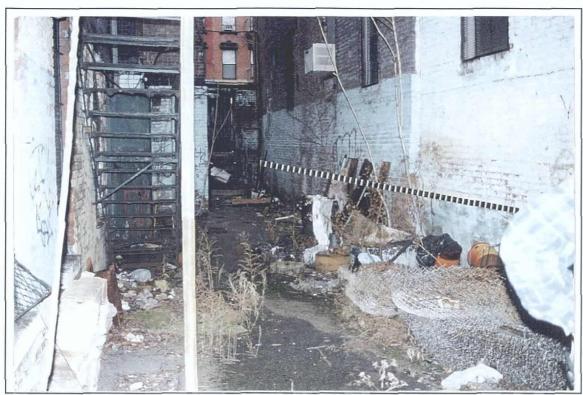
View of Alleyway on the East Side of the Building, Looking Northeast, Showing Approximate Height of pre-1889 Land Surface
